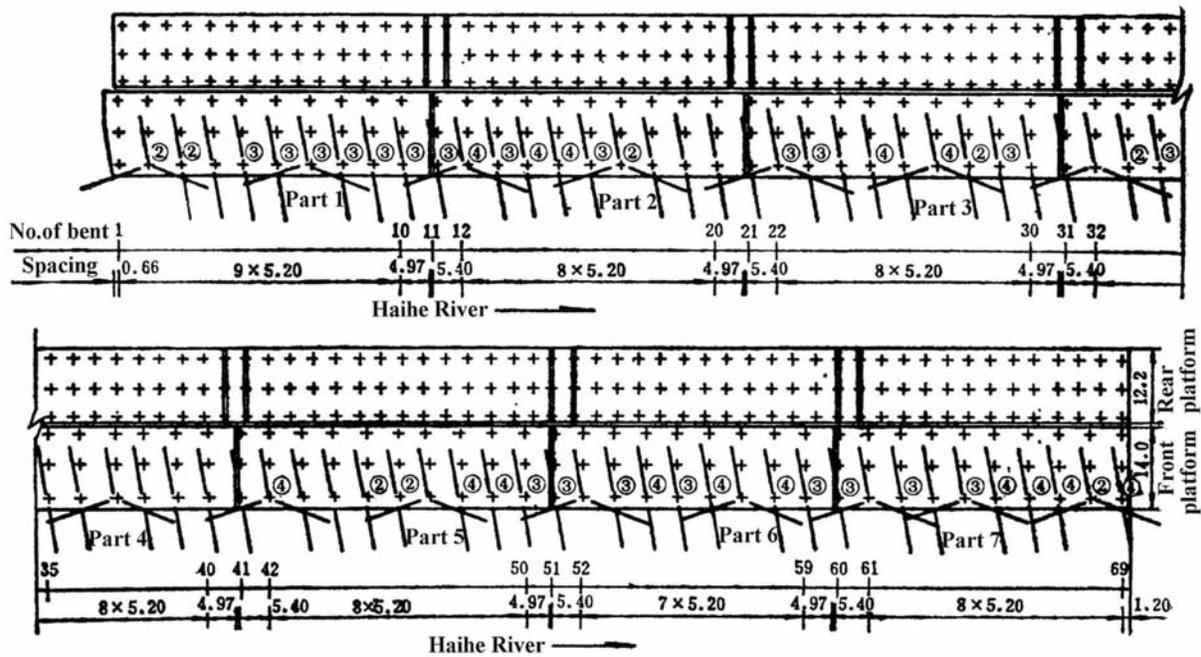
Cracks of pile caps of crossing pile at the front platform of the No. 10 wharf (in m)
